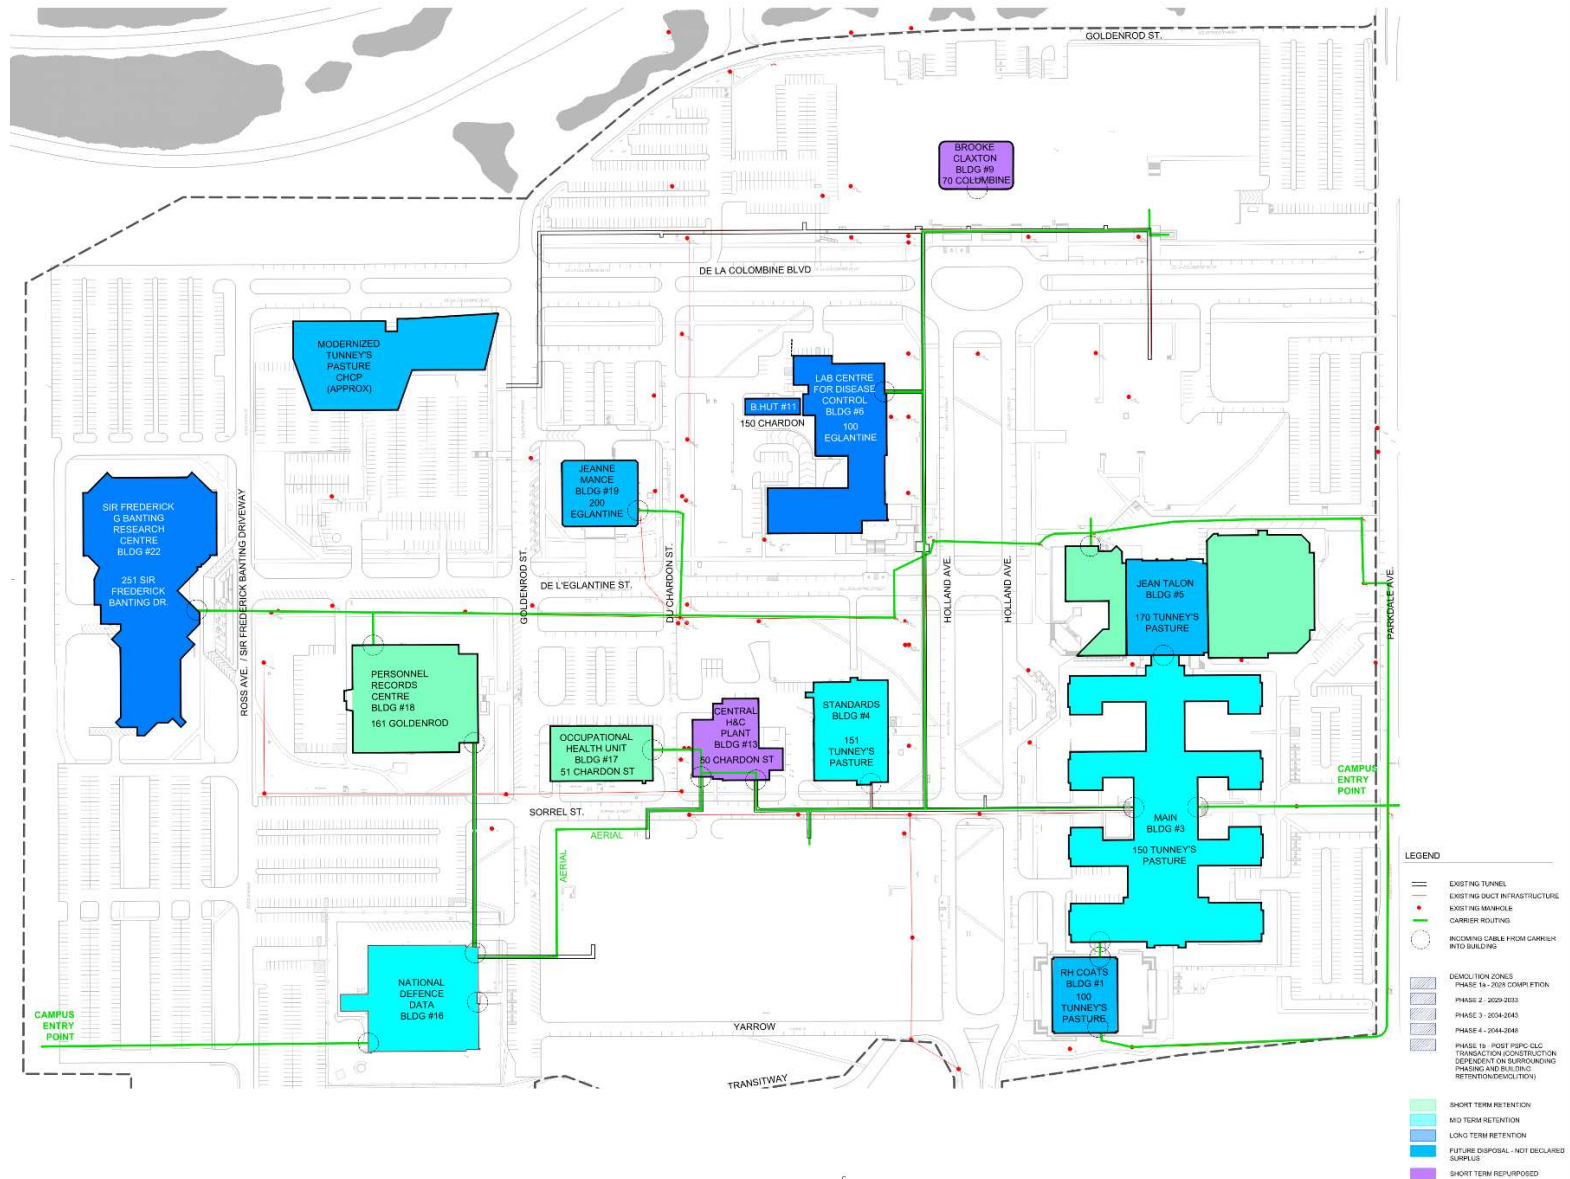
Existing Bell Fibre Routing at Tunney's Pasture
